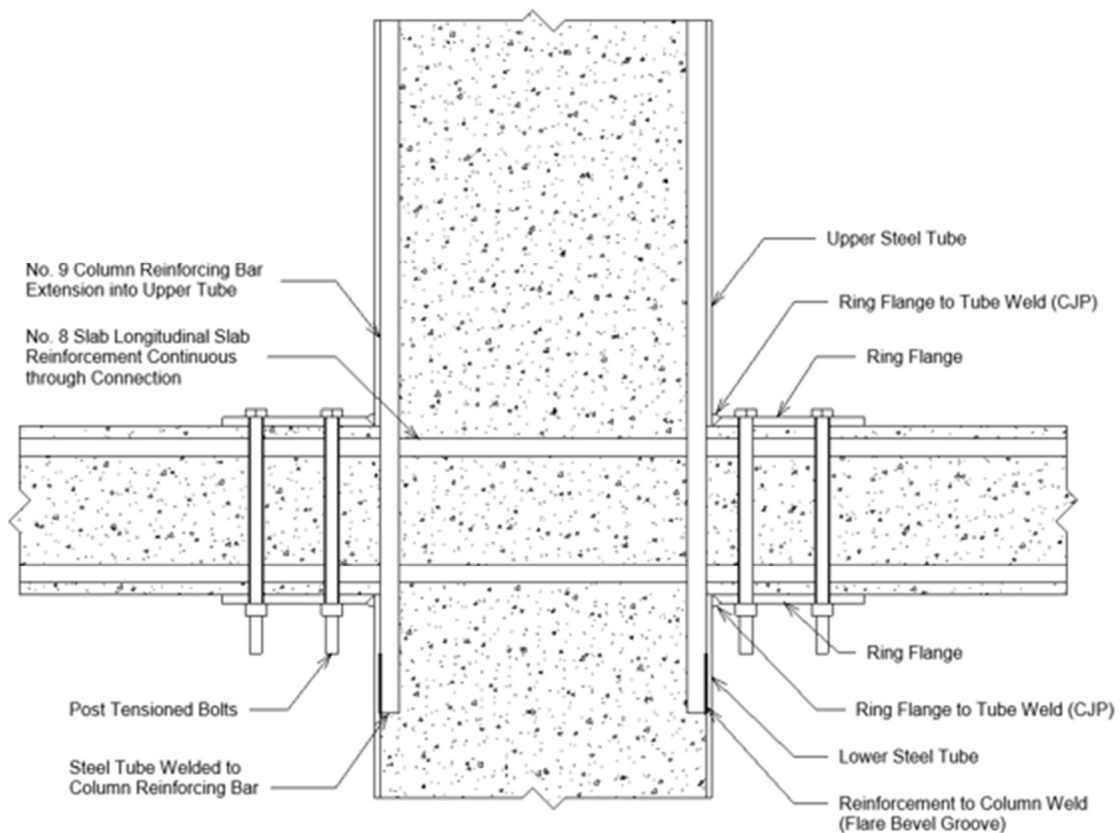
CFST Column with Ring Flange to RC Slab Connection
